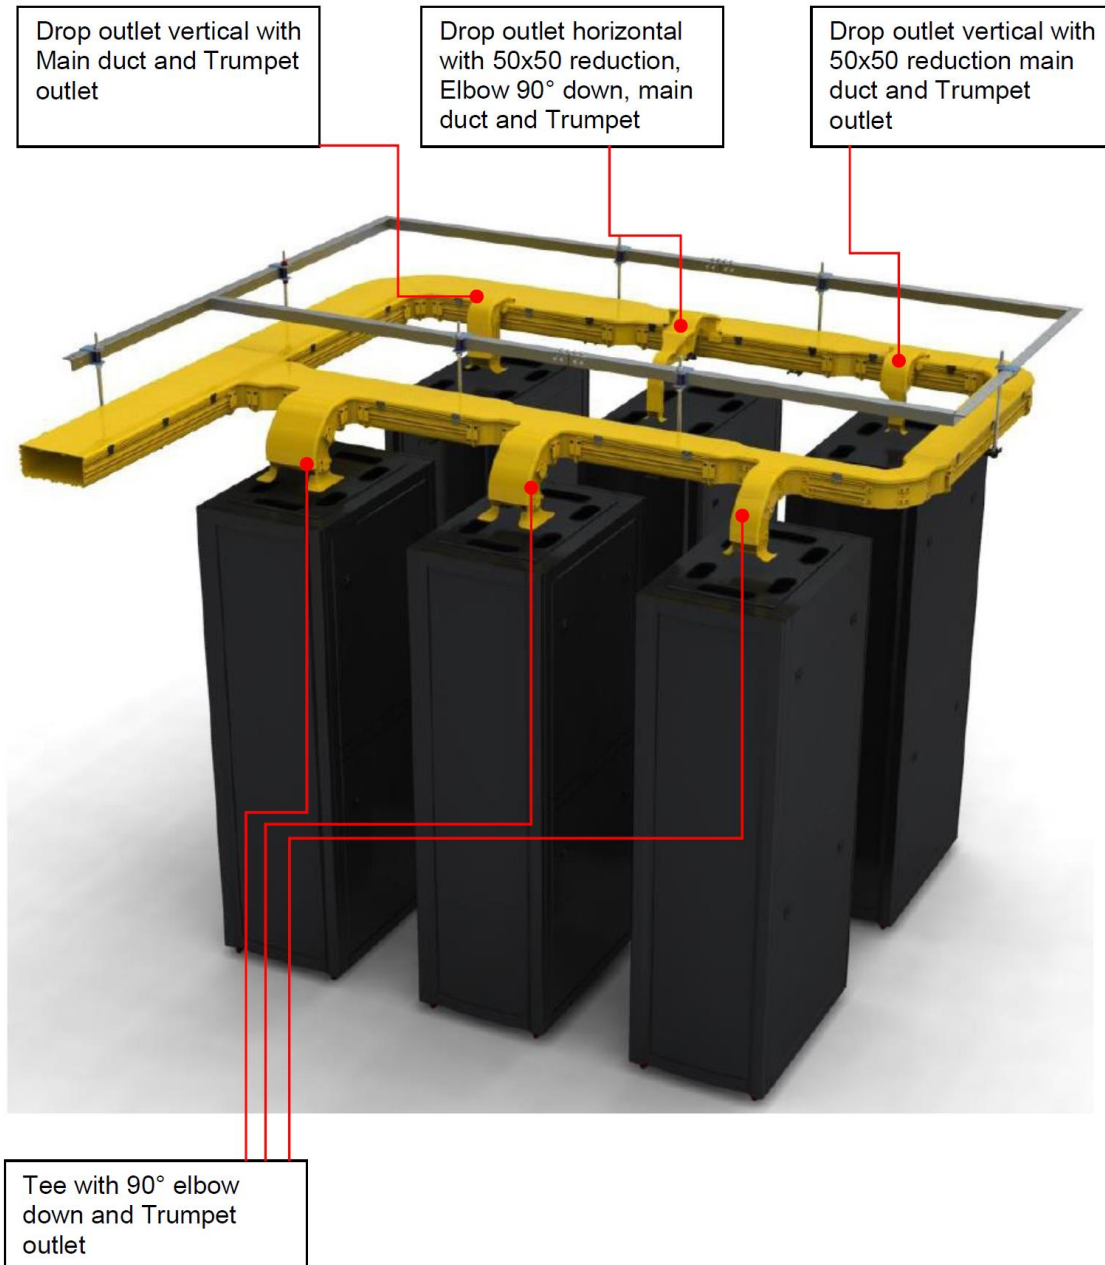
1; Example of use Drop Outlet & Tee RaceWay System
